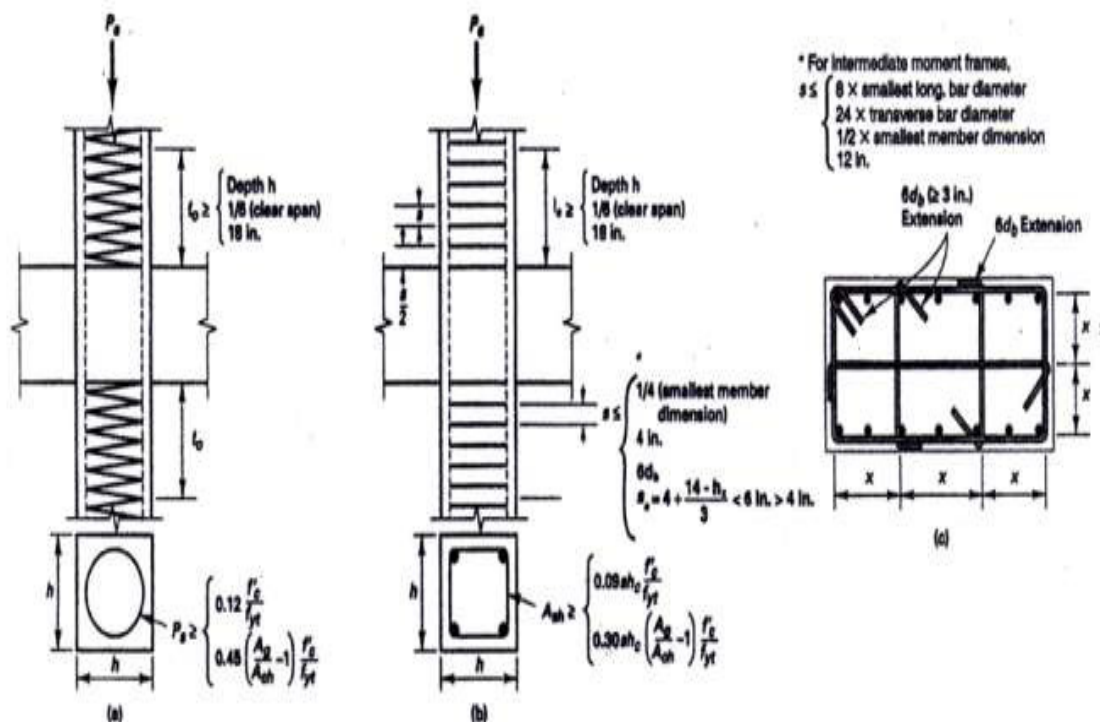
Typical reinforcement details of column confinement: (a) the spiral confinement (b) Confinement with rectangular cross bar, (c) Detail of cross-section of cross bar tie, $x \leq 14$ inch. Transverse row of the tie should have a hook 90° bend on the opposite side (Fanella David A and Munshi Javeed. A, 1998)
